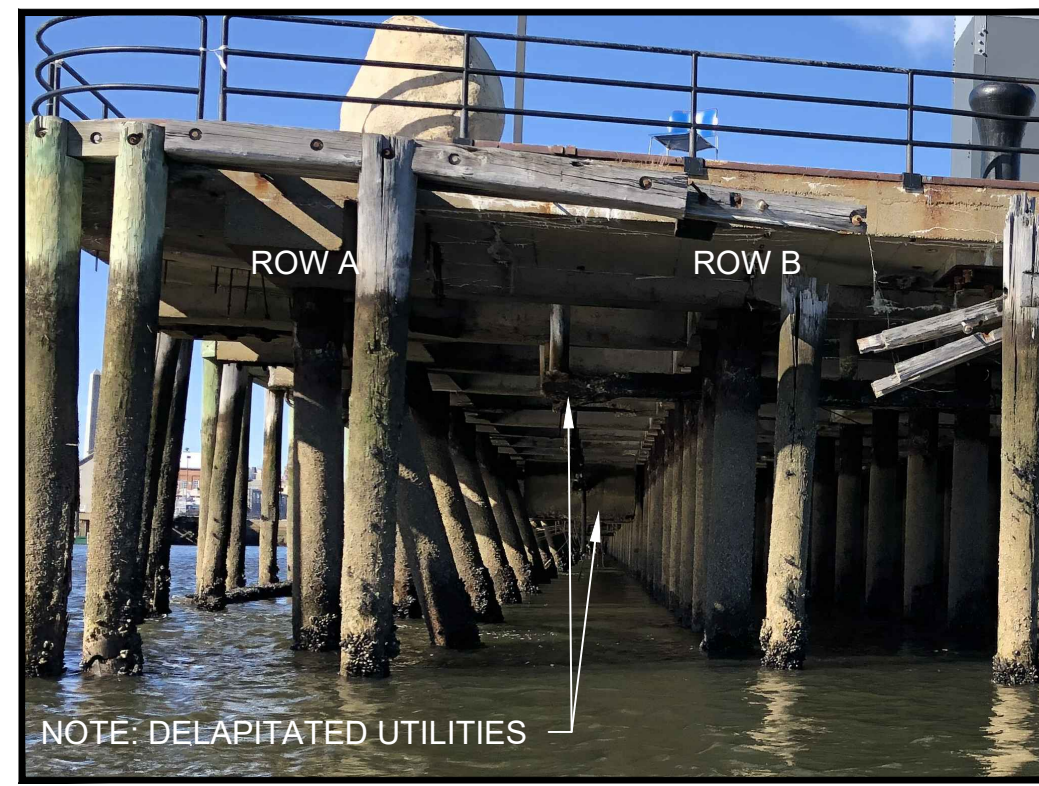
LOOKING NORTH BETWEEN ROWS A & B
